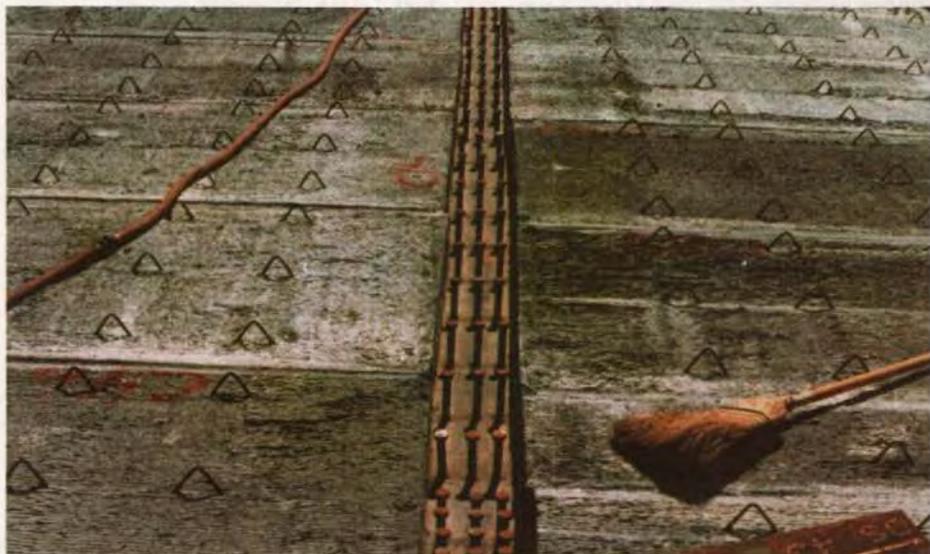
The deck panels and steel shear connectors in place ready for reinforcing steel and deck concrete.
